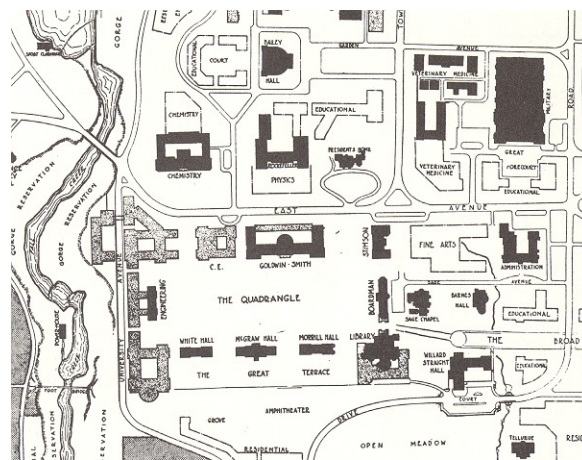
1925 “General Plan for Cornell University” showing proposed engineering complex at the north end of the quadrangle.
